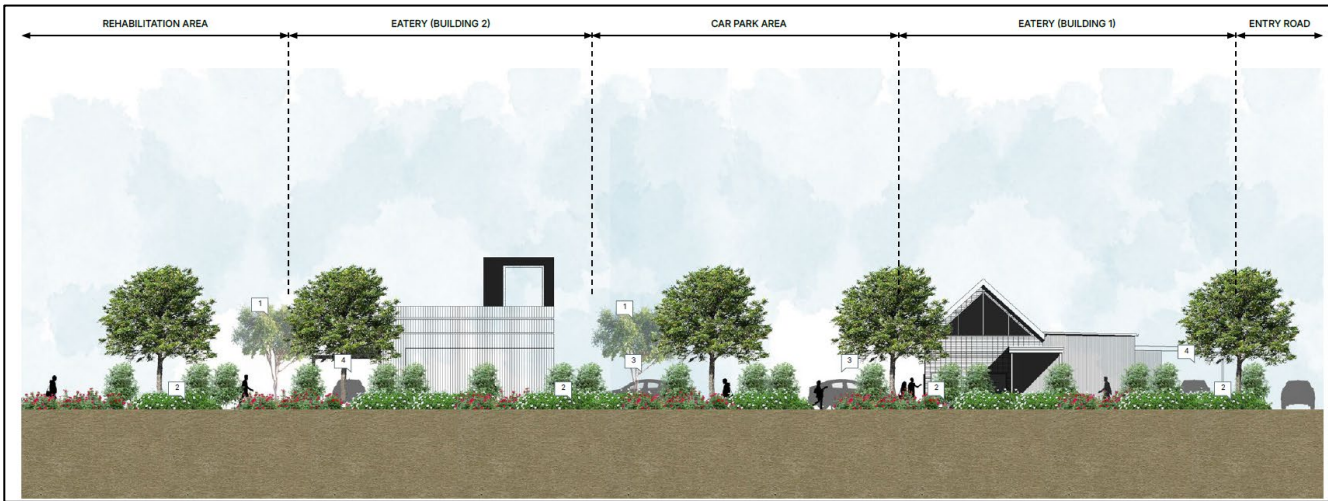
Street View from Wynnum Road – Landscape Concept Plan
